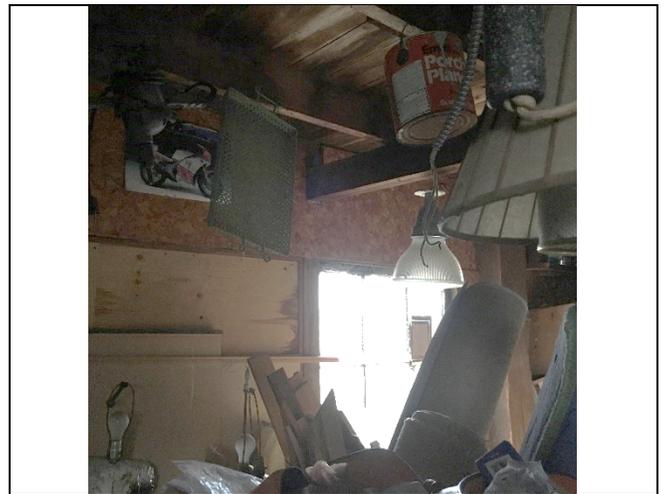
The condition of the exposed ceiling structure in the storage area appears to be consistent with the initial assessment.
